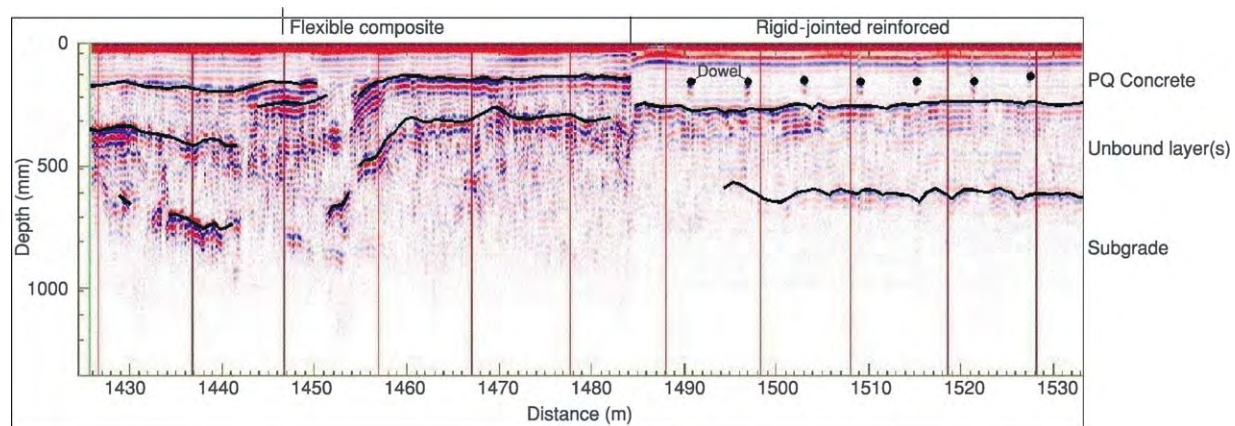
GPR pavement survey, illustrating two types of pavement construction.
